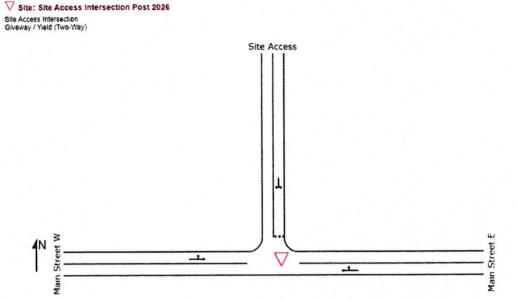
SIDRA Generated Intersection Layout - Site Access Intersection
